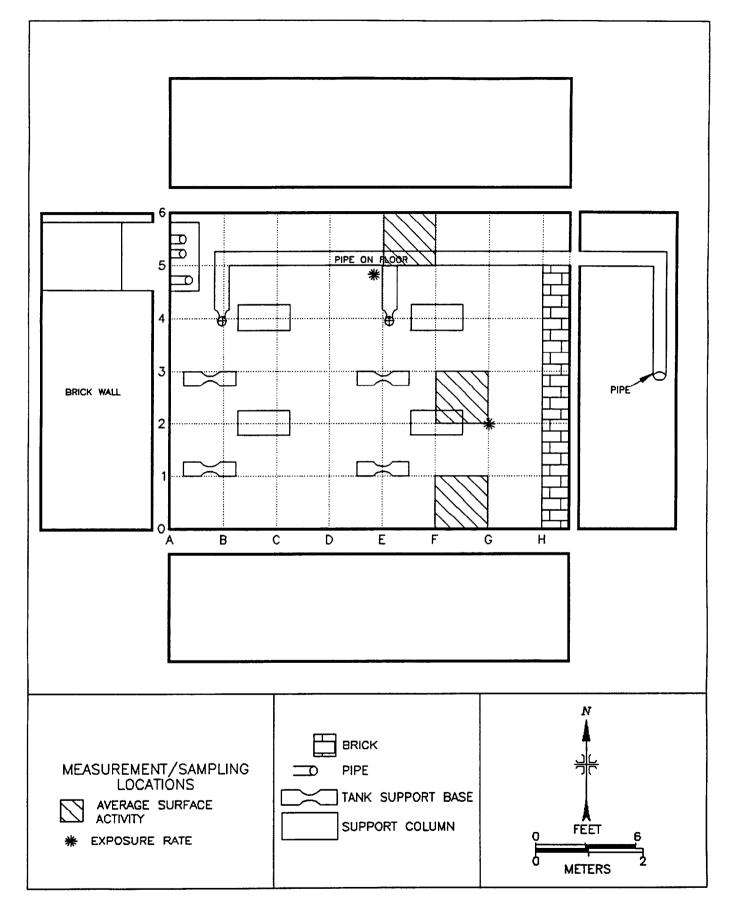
Building 8, Basement - Measurement and Sampling Locations
